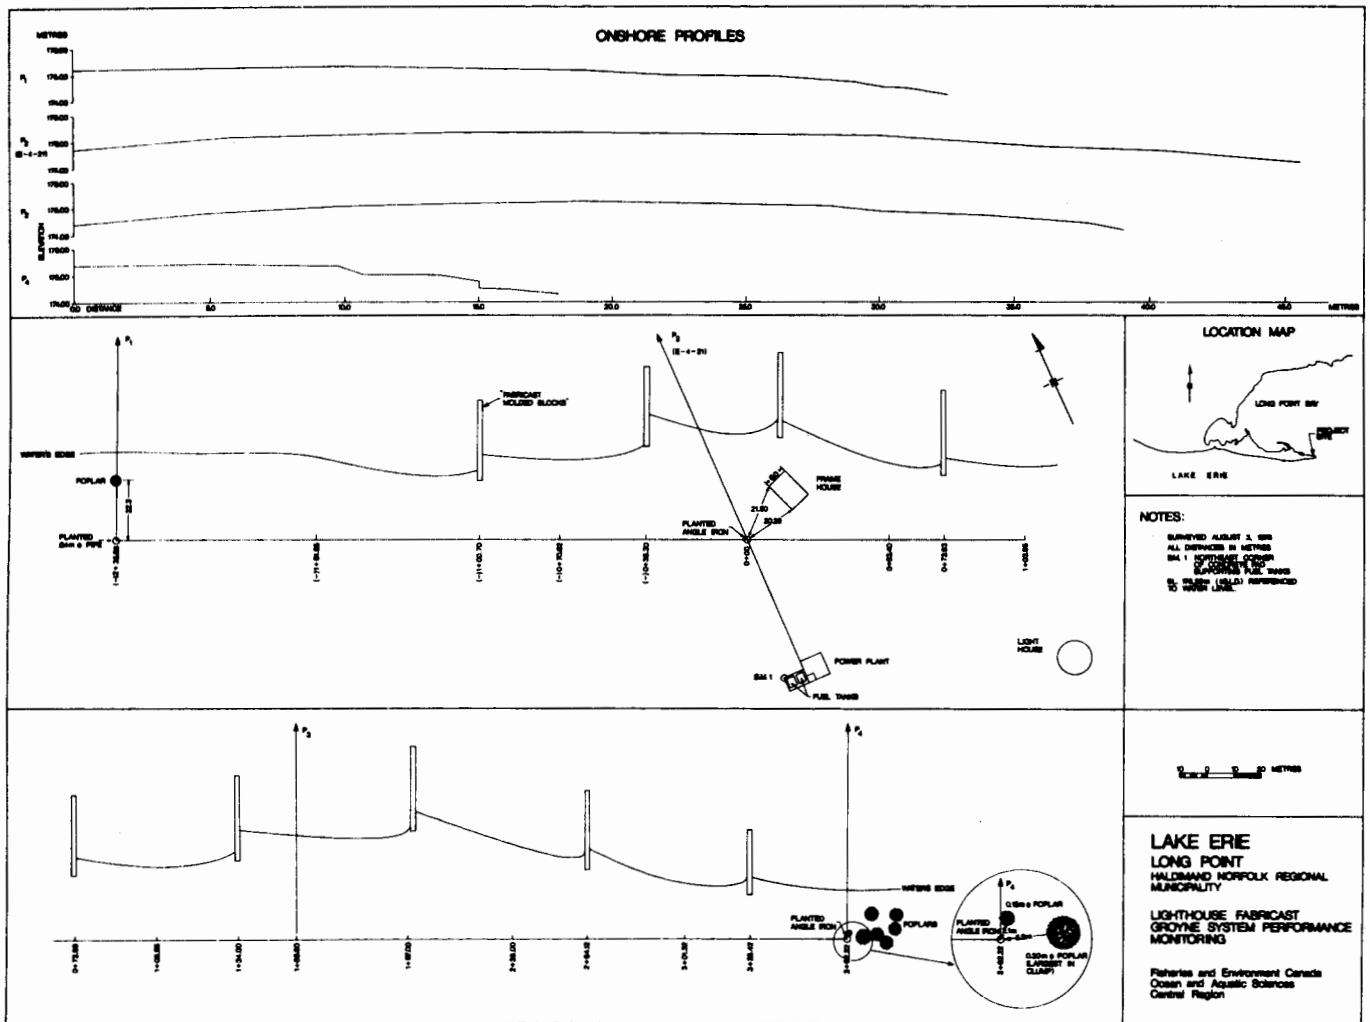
Site Plan of Long Point Groynes and Survey Lines
